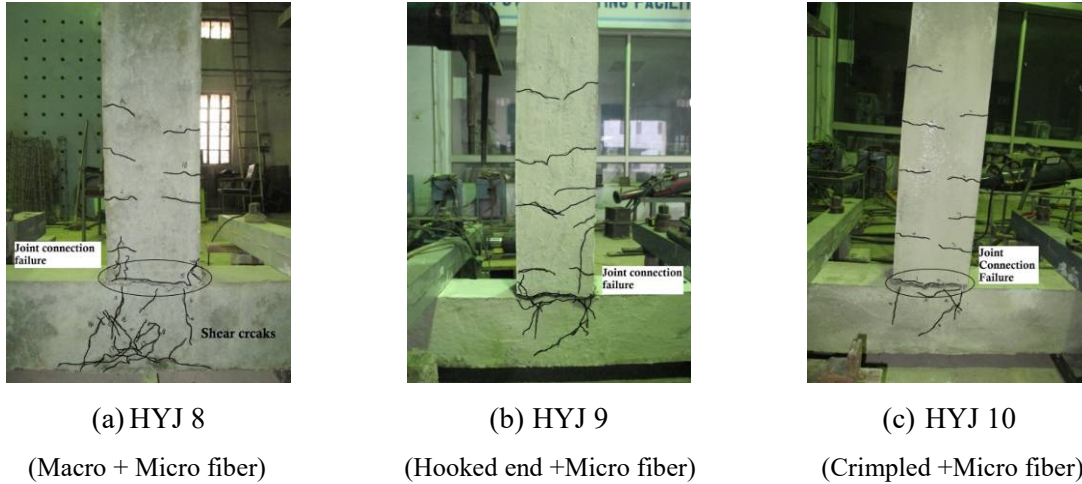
Failure pattern of hybrid fiber reinforced concrete joint specimens
